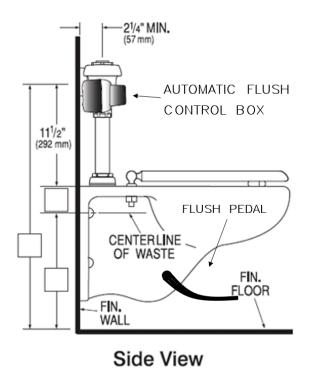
A side-view paper prototype drawing of a foot pedal design implementation.
